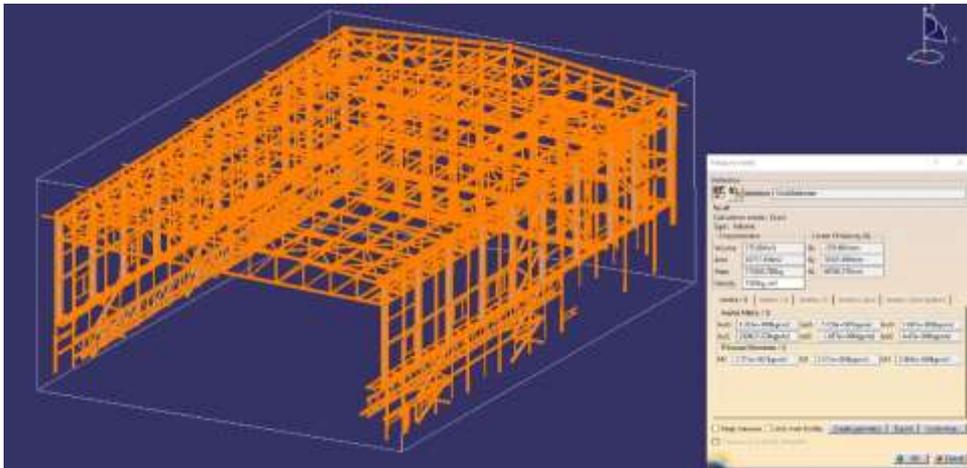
B11 CMM - Crane Hall Steel Frame.
